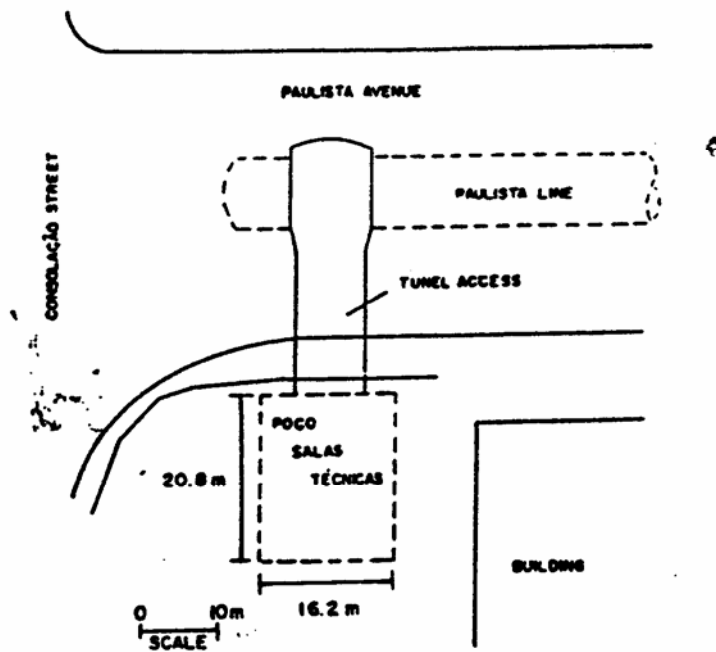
Localization of the Poço Salas Técnicas Excavation
